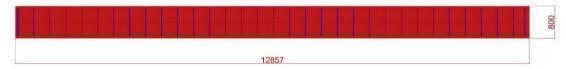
Longitudinal section of the deck beam, zoomed in. Units in mm.
